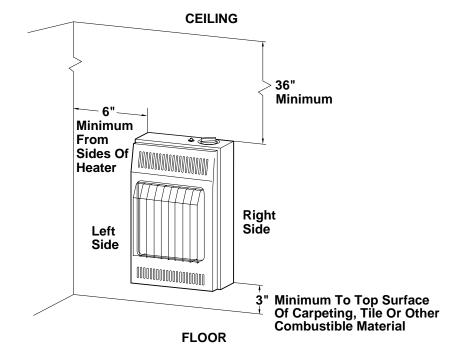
Mounting Clearances As Viewed From Front of Heater
